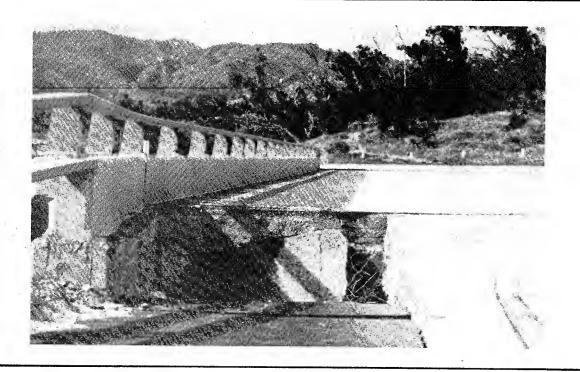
Differential settlement of backfill at abutment Roxford Street Undercrossing at Foothill Boulevard
